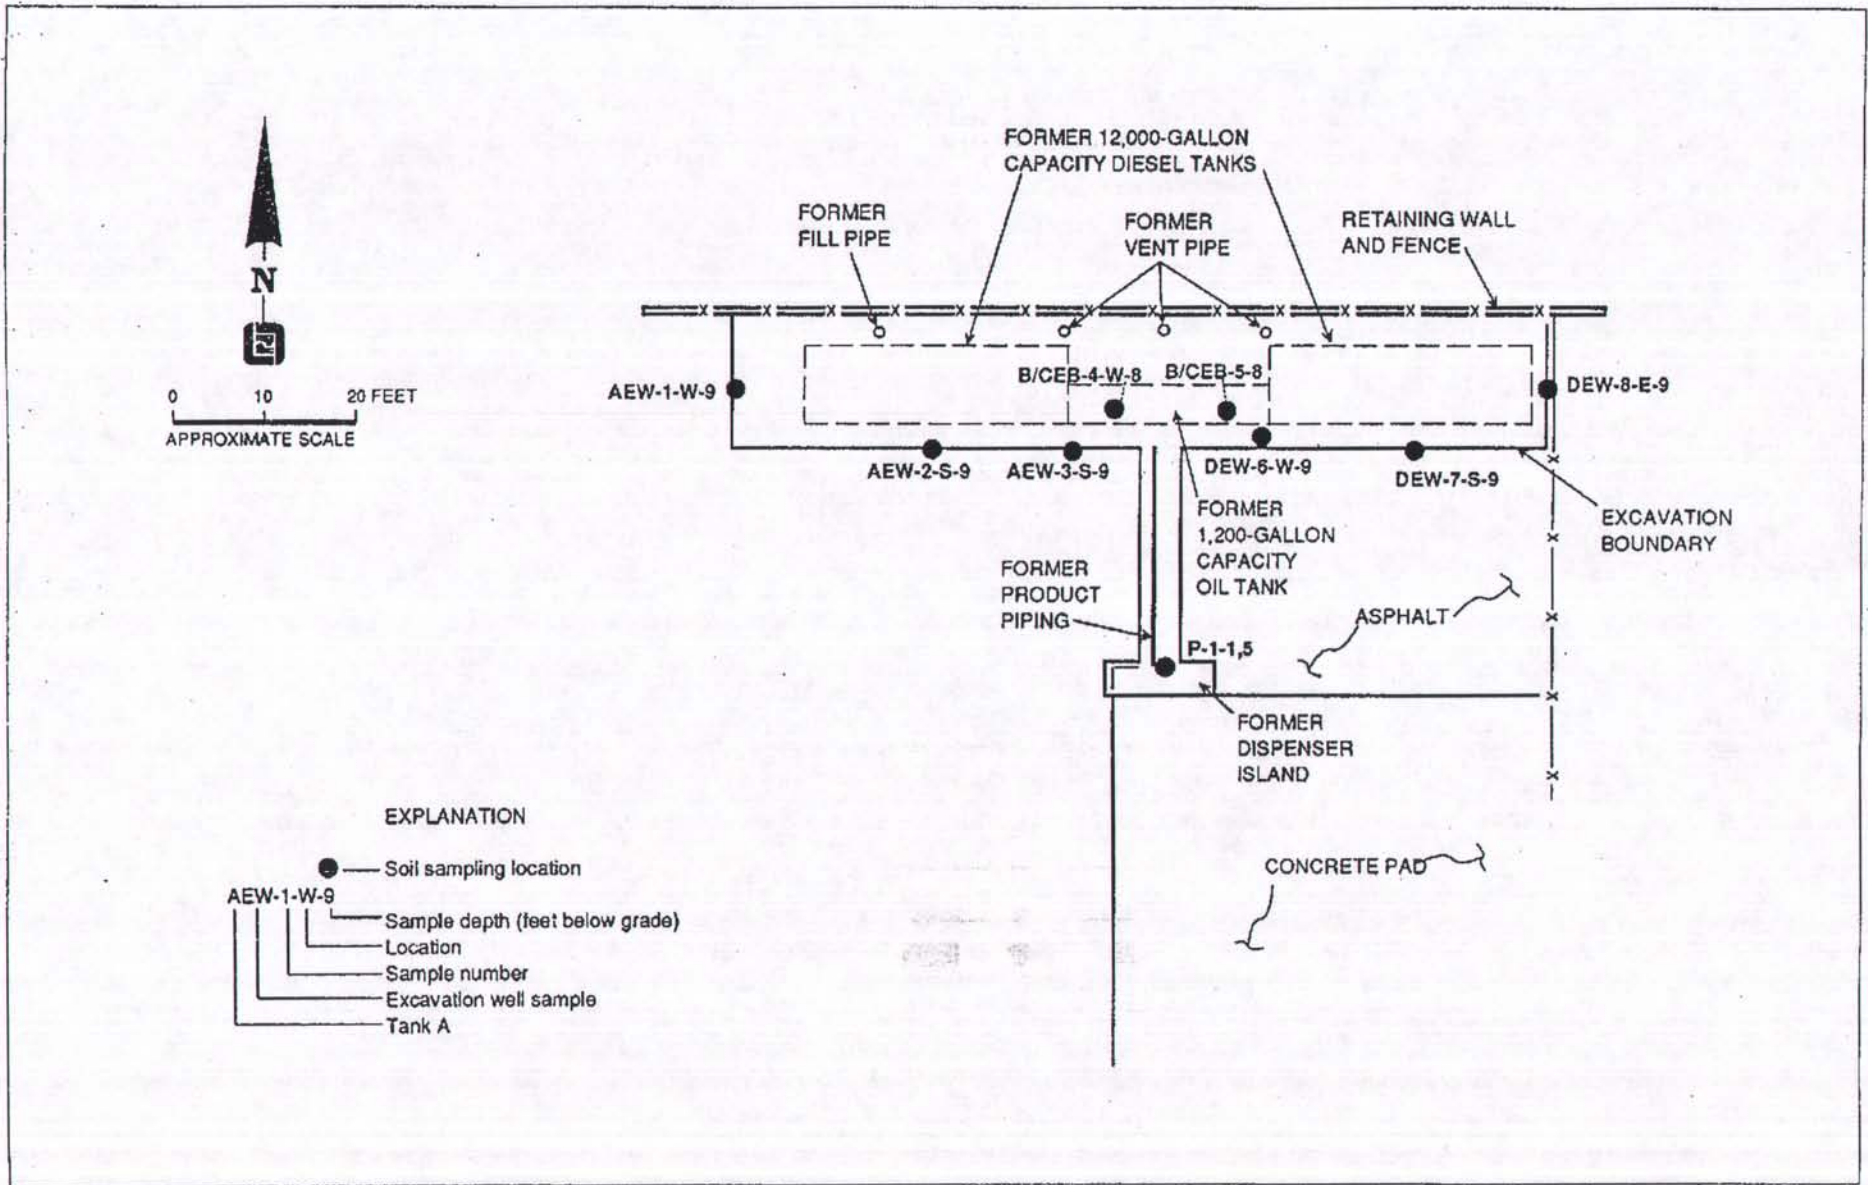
SITE PLAN SHOWING FORMER TANK AND SOIL SAMPLING LOCATIONS AND EXCAVATION BOUNDARIES
